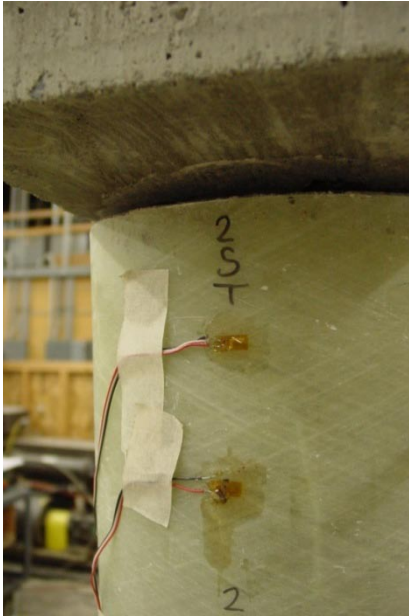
Northern column of specimen F-FRP1 undergoing rocking mechanism
